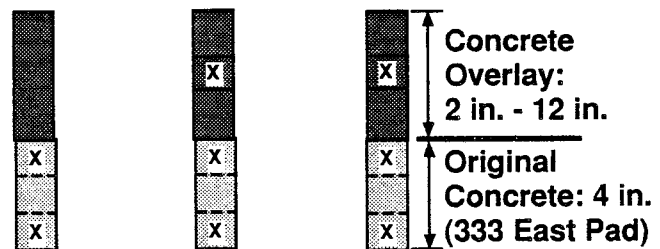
Concrete Sampling Sites for the 300 Area Solvent Evaporator.
